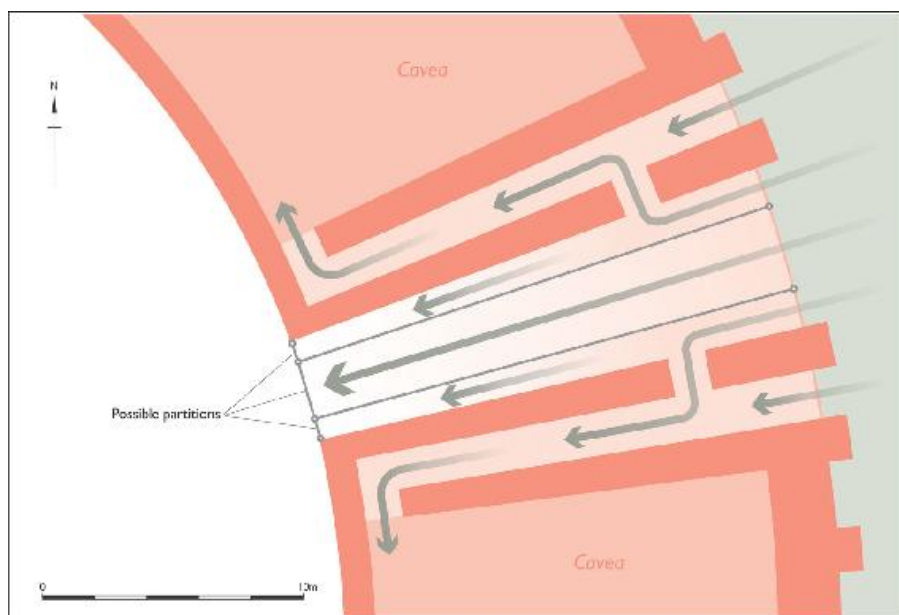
Reconstructed plan of Entrance 3 reconstructing the access routes into the
